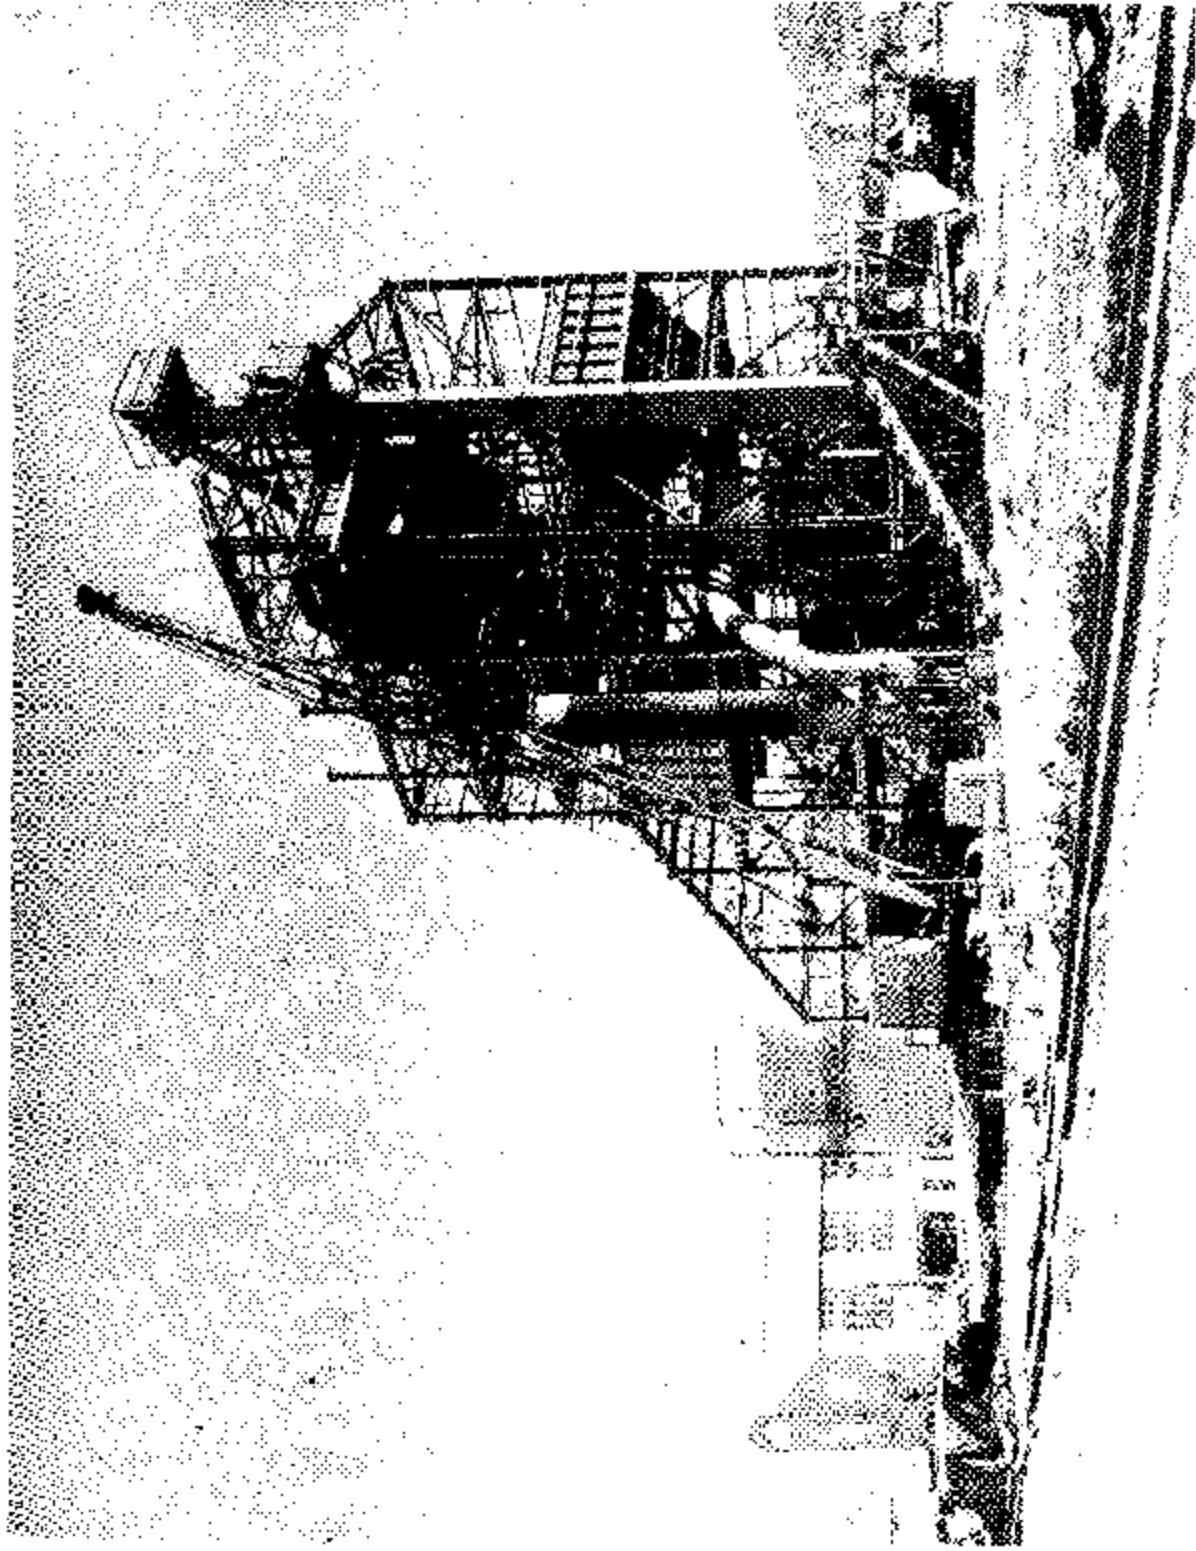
Coal-gasification building under construction. Oxygen holder and building, left background.
